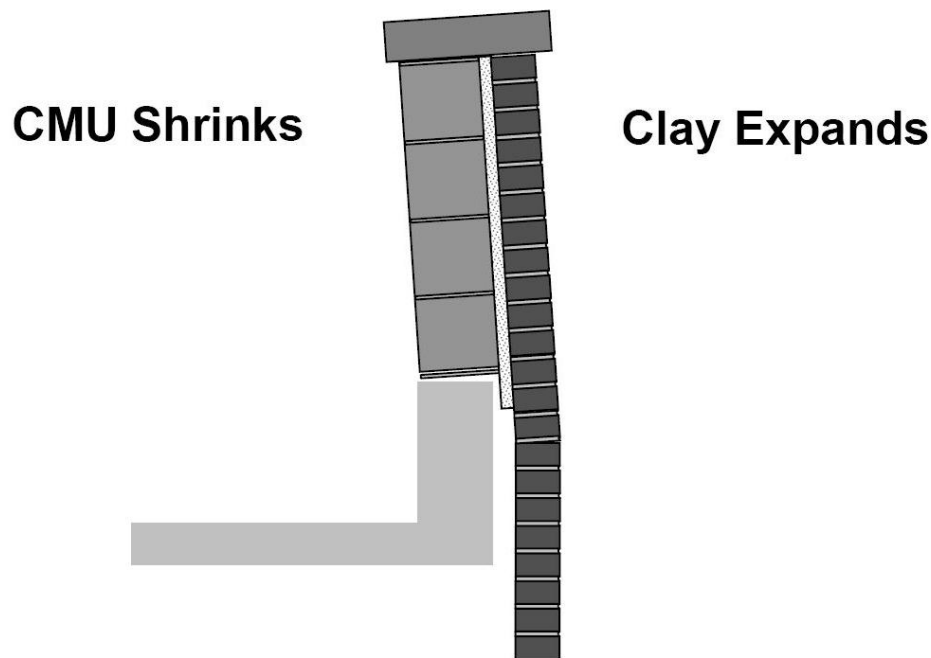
Leaning parapet caused by volumetric changes in clay brick and concrete masonry units, and by lack of relieving angles (Peraza, 2009)
